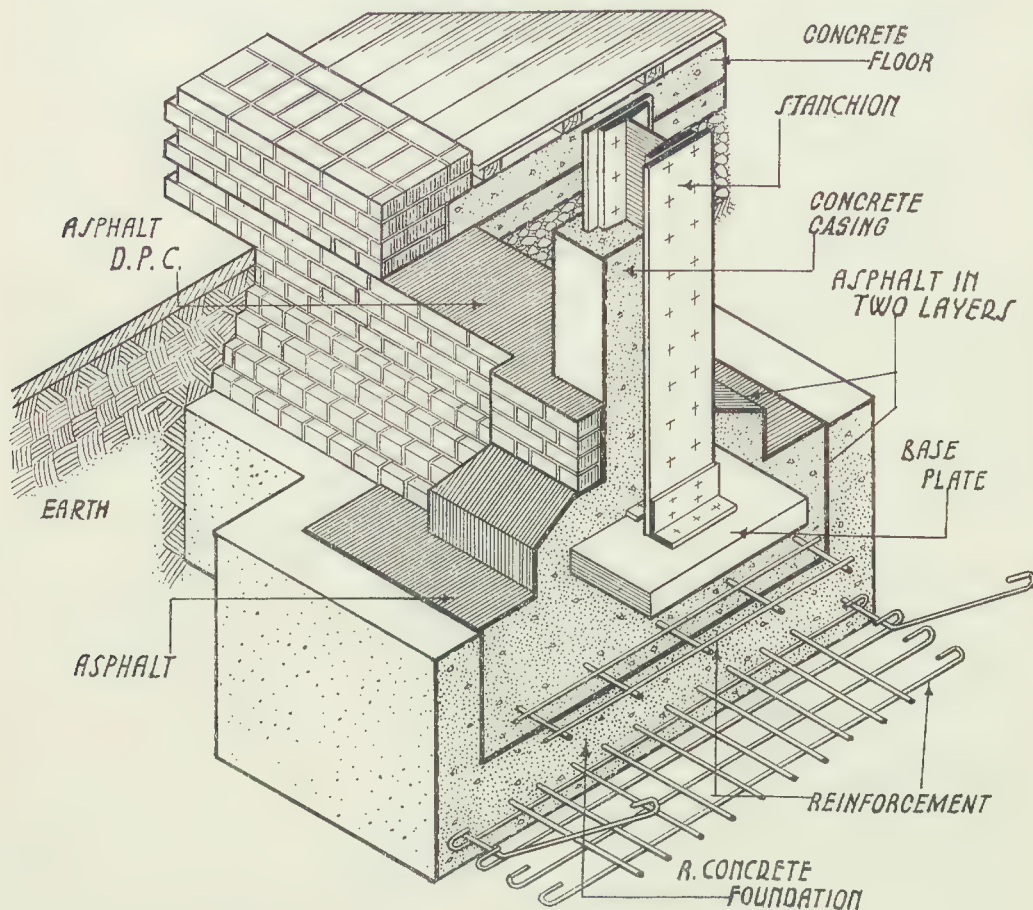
INSULATION OF STANCHION BASE AT THE JUNCTION WITH BRICK EXTERNAL WALL
